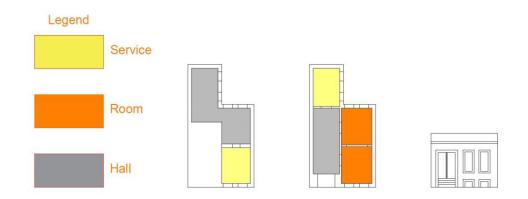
The base sample of the single-story İzmir Houses in with plan type 3
